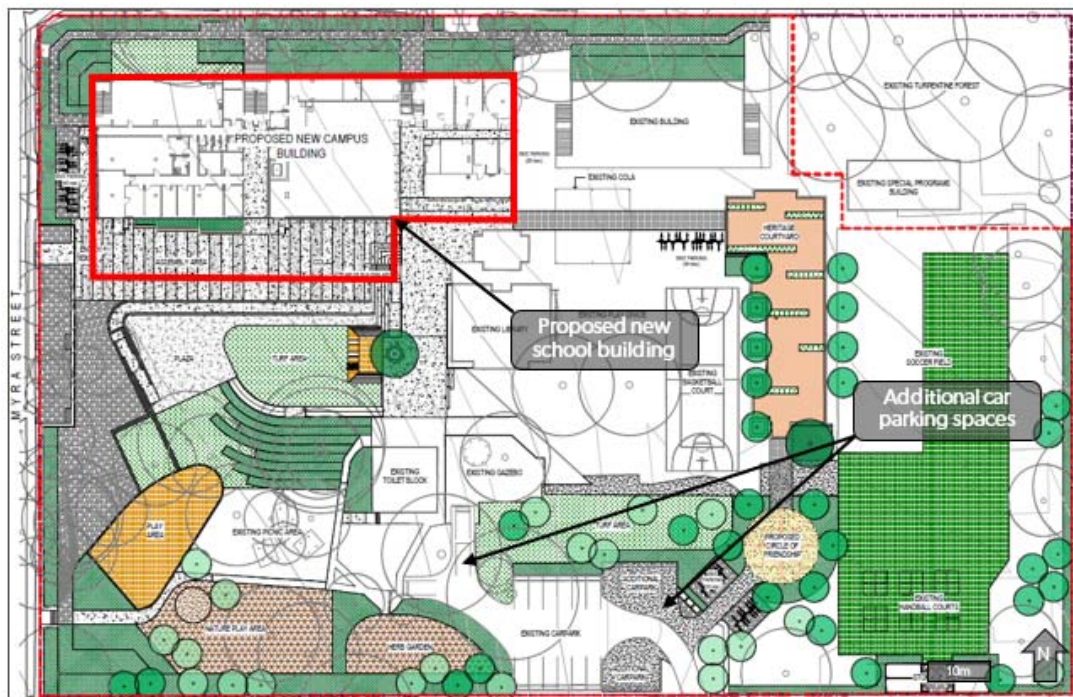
| Approved site layout (Source: Department's original assessment report 2019)
